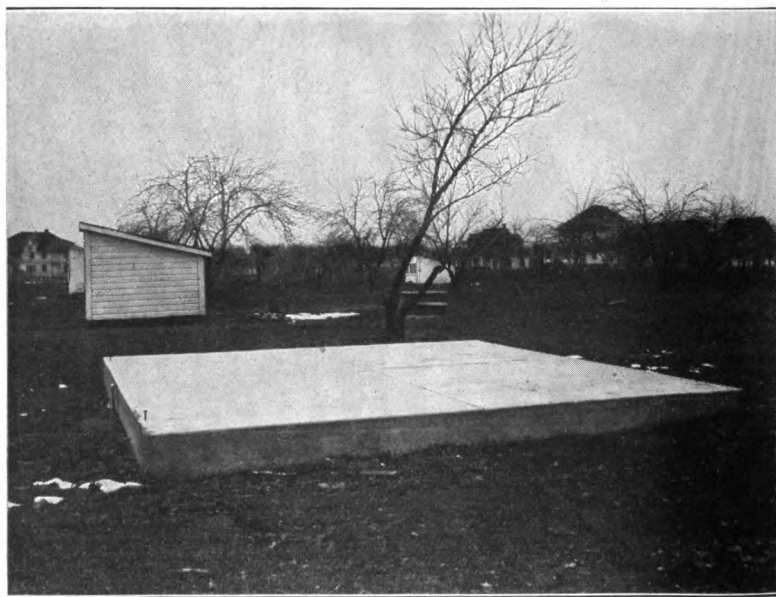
A finished concrete floor and foundation, 14x14 ft., ready to receive a fool-proof poultry house.
